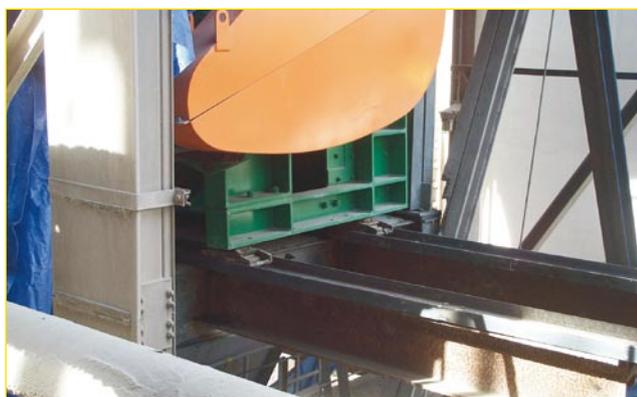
Installation was carried out by building slides to set the feeder into its proper position.
